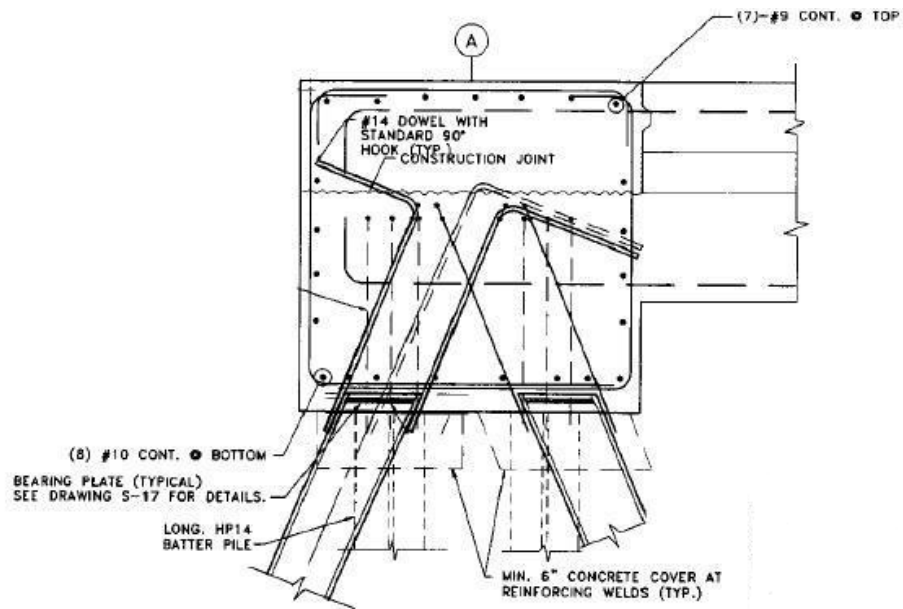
Alternative steel pile connections of a H-section pile (Roder, 2002)
